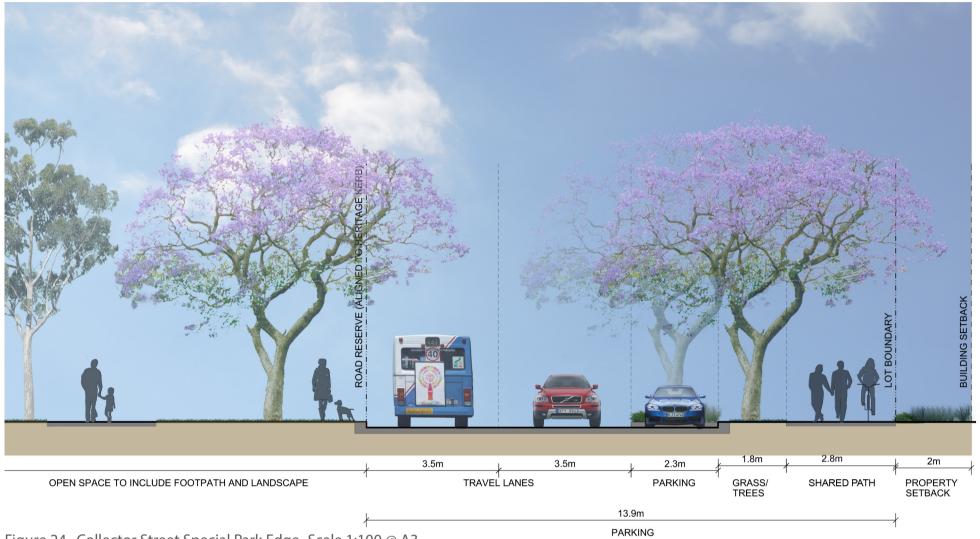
Collector Street Special Park Edge_Scale 1:100 @ A3
